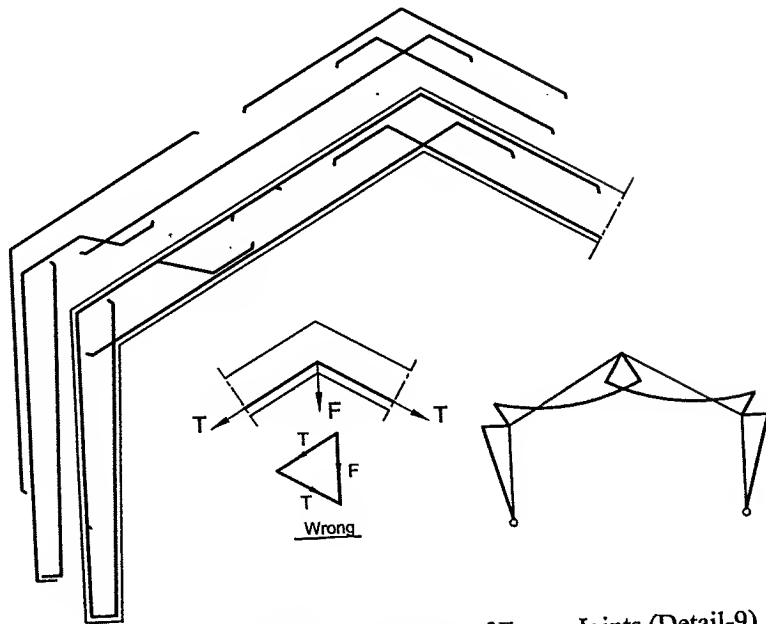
Detailing of Frame Joints (Detail-9)
